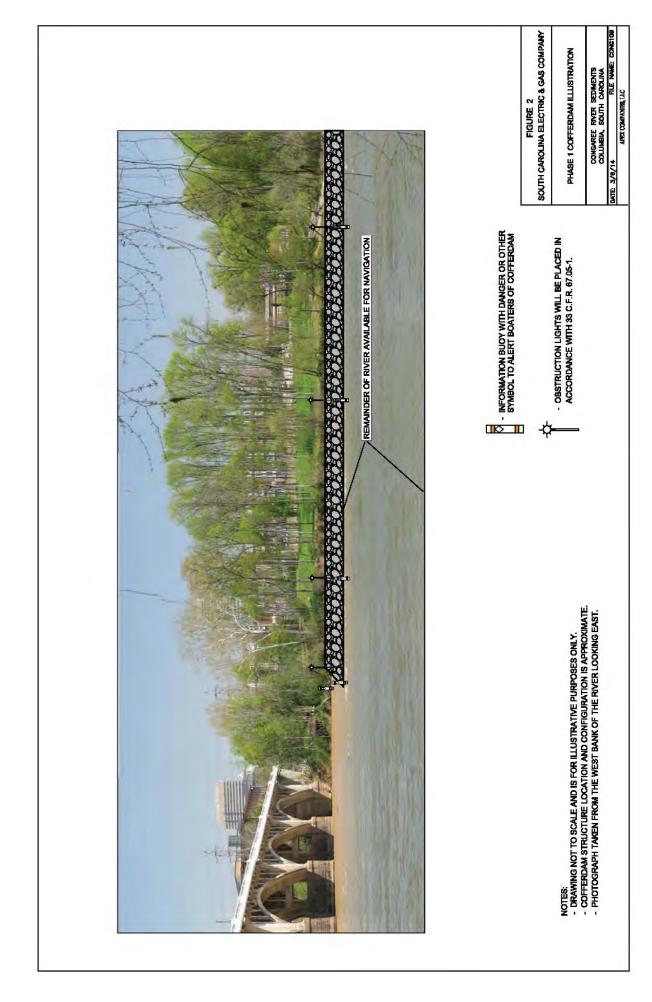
Conceptual drawing showing approximate height and style of proposed coffer dam.
